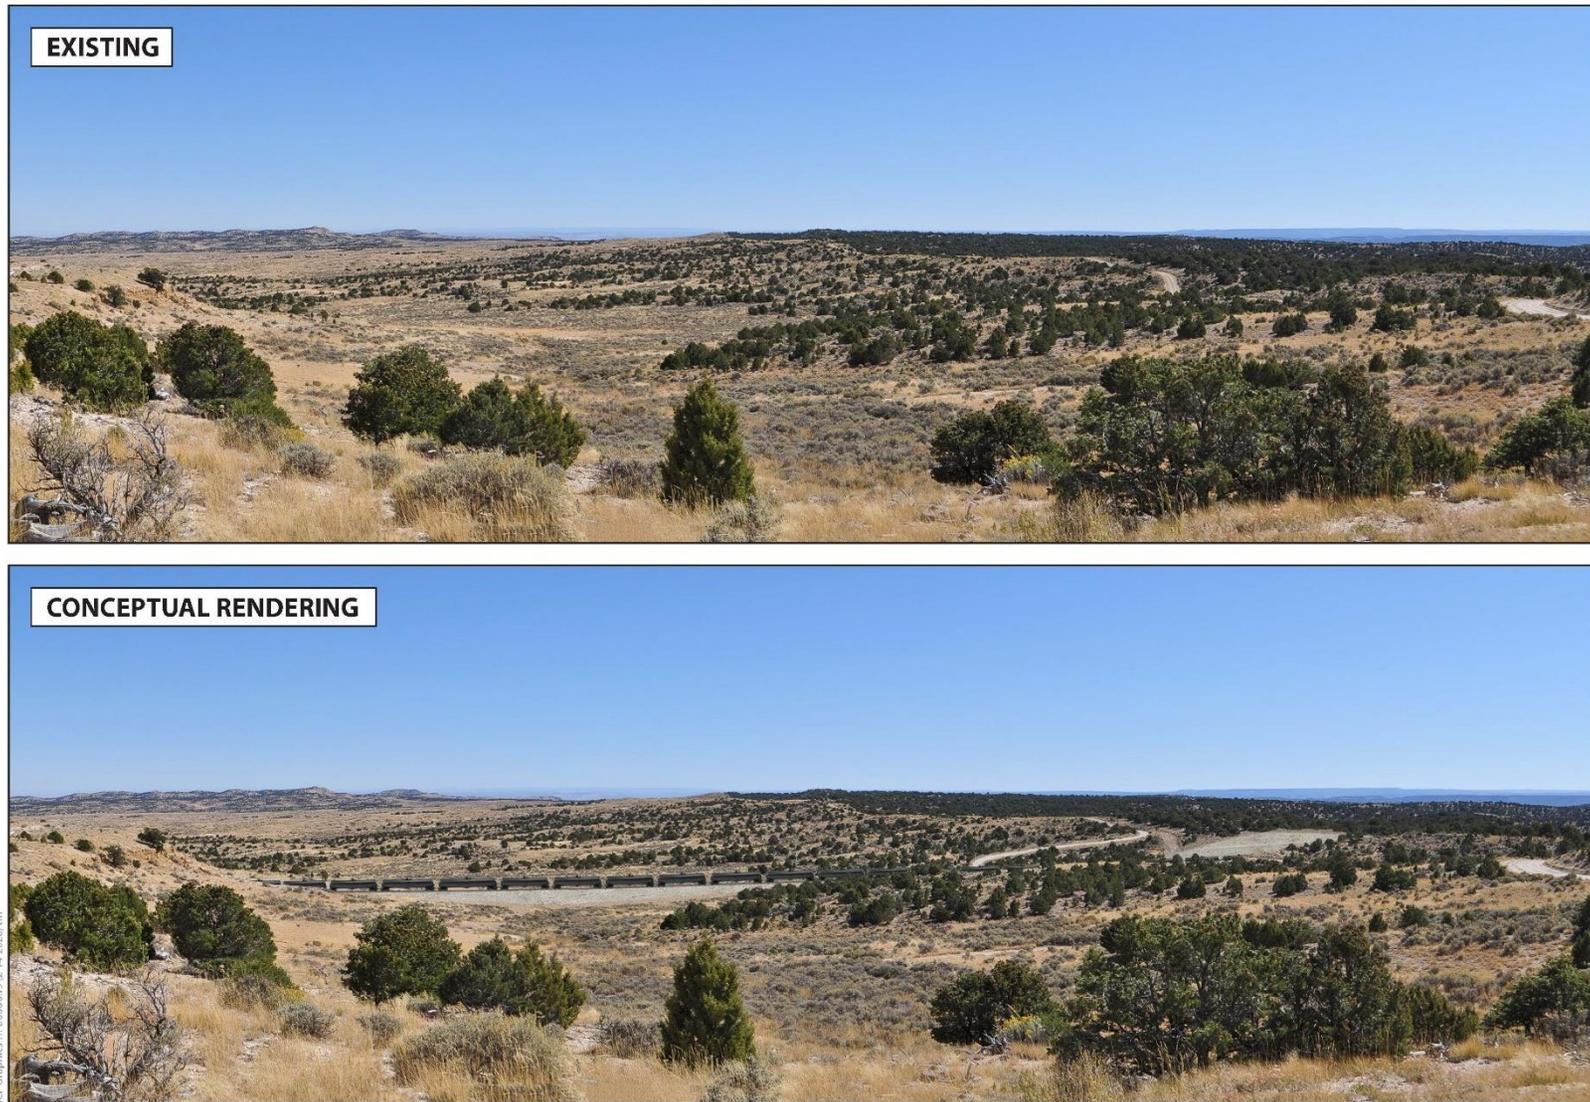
RKOP 044 Looking East–Southeast toward Milepost 57 (Wells Draw Alternative)
